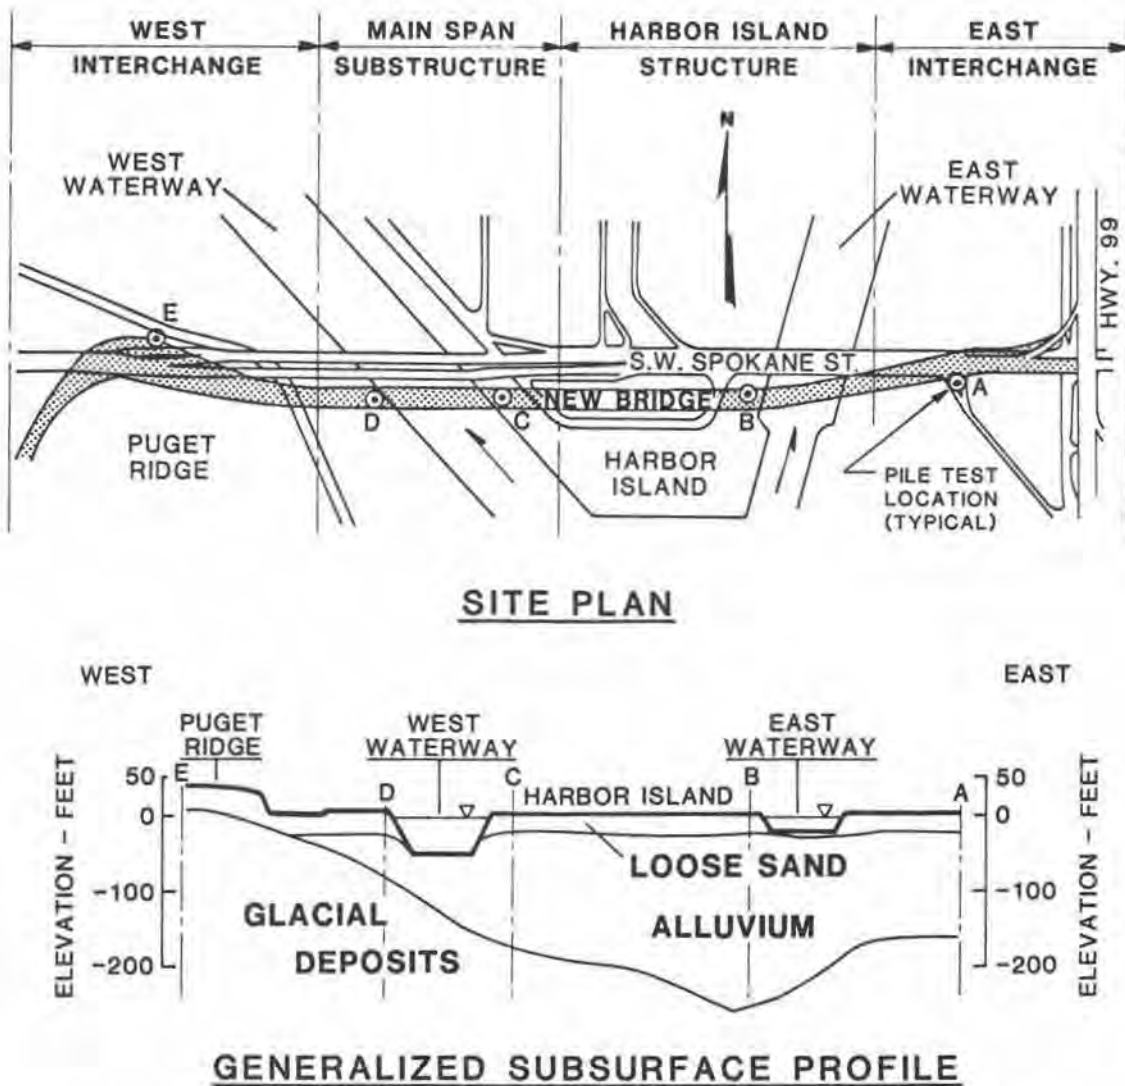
Site plan and generalized subsurface profile, West Seattle Freeway Bridge.
